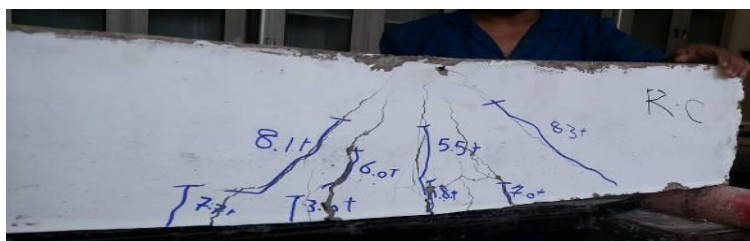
Crack Pattern and Mode of Failure of a Non-prestressed beam without CNT (RC- 400) under the Elevated temperature
